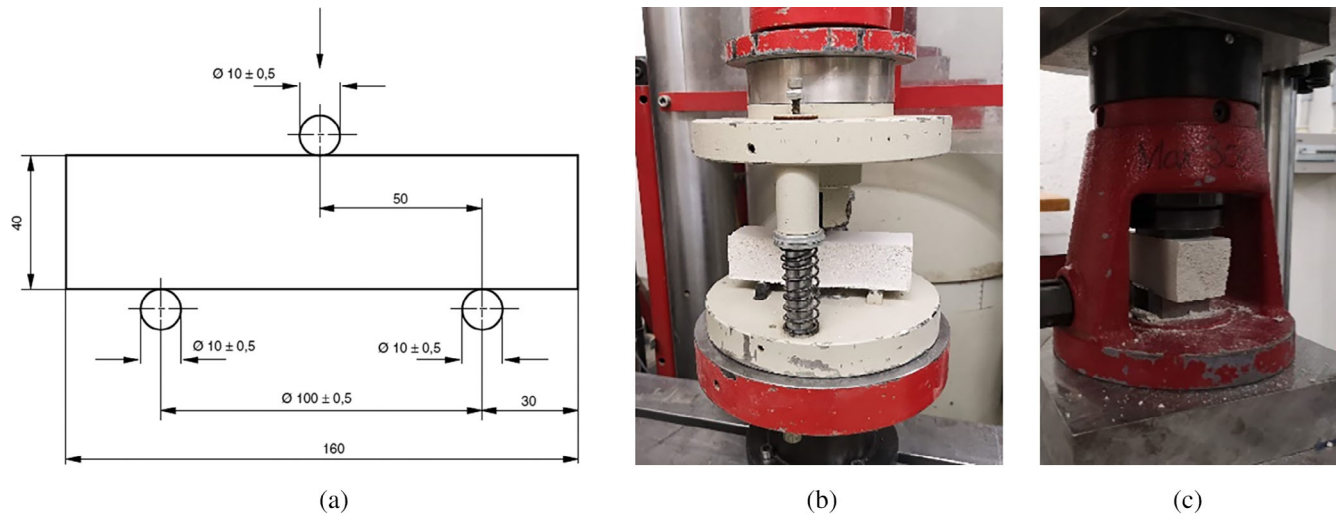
Concrete beam test: (a) specimen; (b) three-point bending test; and (c) compression test.
